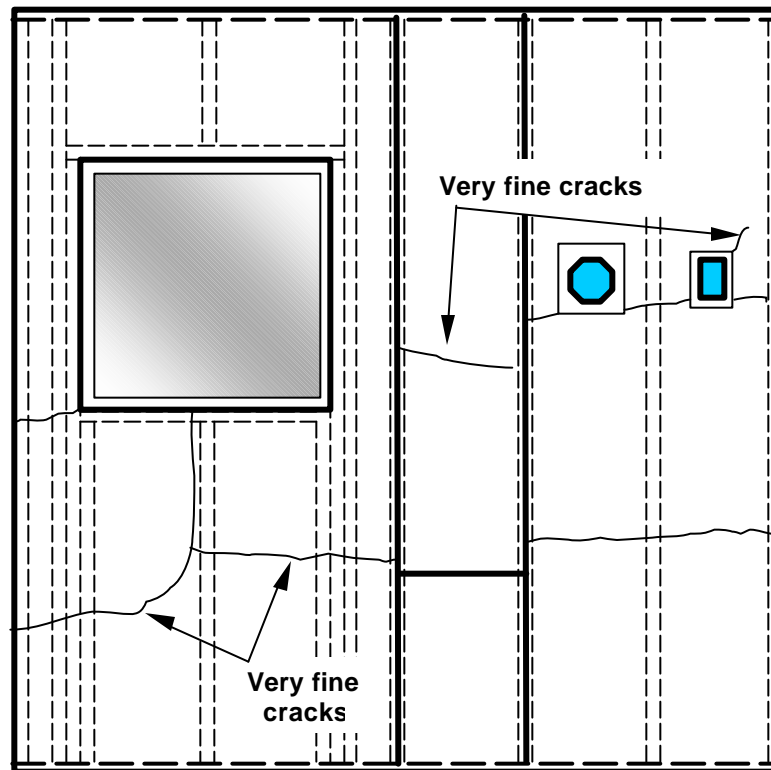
Wall Assembly 2A after transport – visual inspection of the surface did not reveal any additional cracks due to transport (6 April 02) – hence figures depict the same series of cracks
